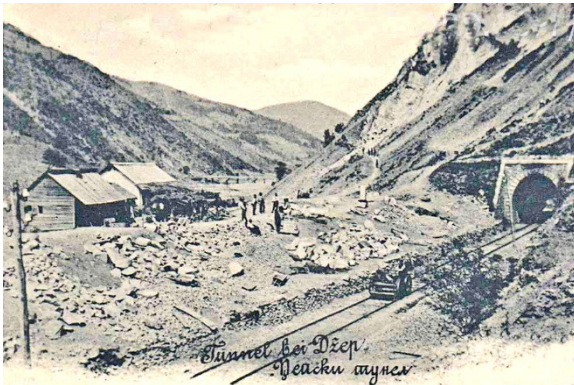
Building the tunnel near the Džep railway station, 1886 (source: Wikimedia)
